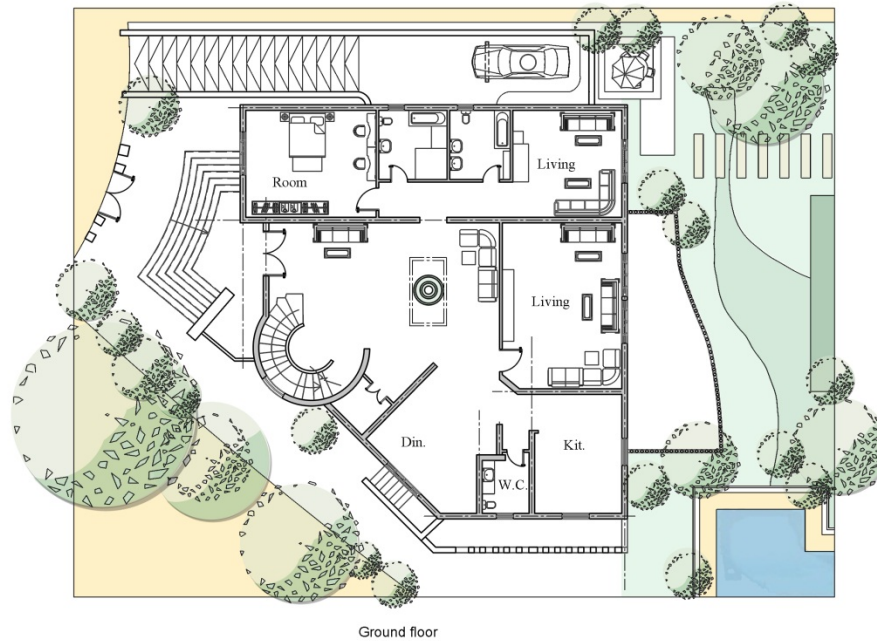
Ground floor plan of the villa in 6th of October District in Giza.
